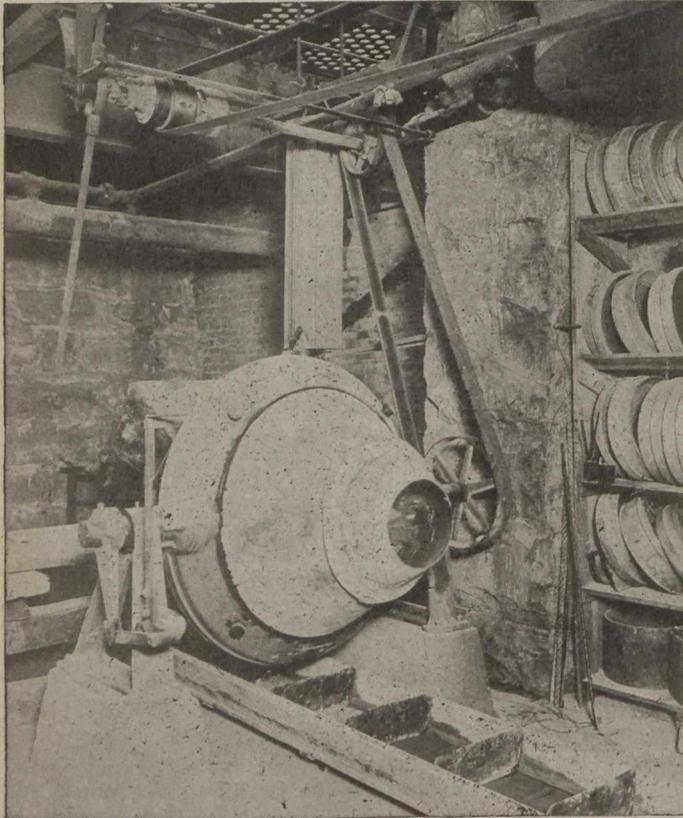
$3\frac{1}{2}$ -Cu. Ft. Concrete Mixer Used in Tests
